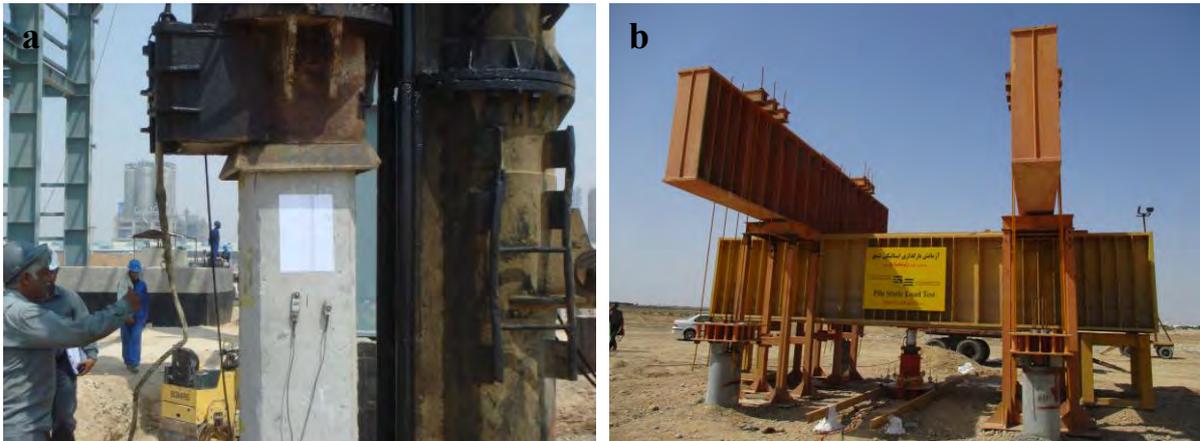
(a) Dynamic pile load test (b) Platform, girders and reaction set up for static axial load test.
